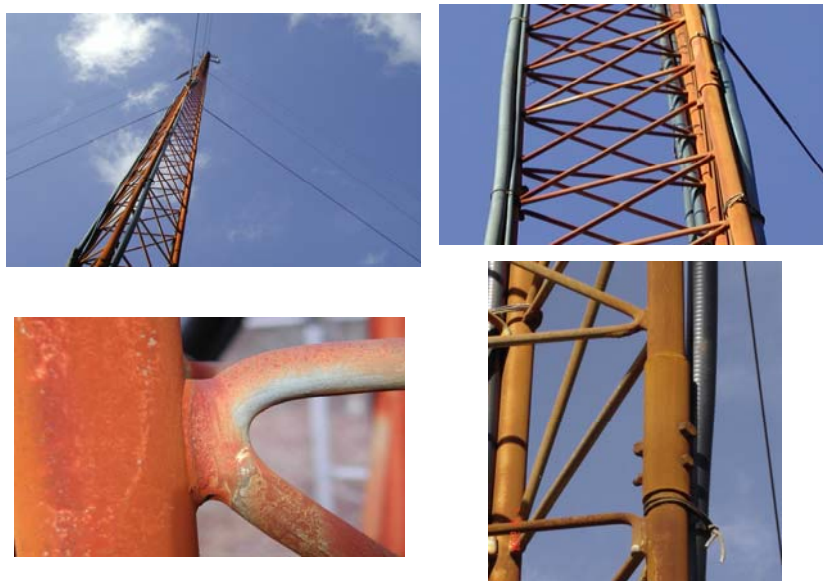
Various details of central mast of Taum Sauk tower showing corrosion and staining.
